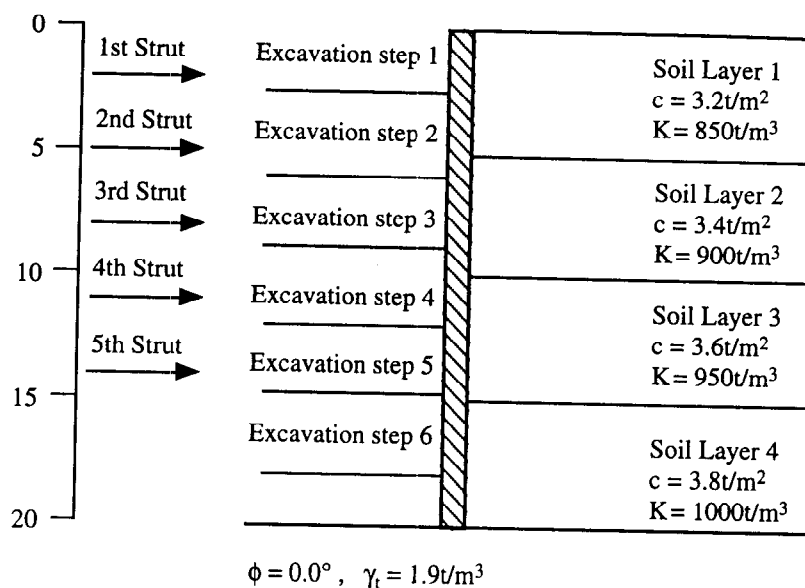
Material properties of soil layers, excavation step and geometry of the earth-retaining structure
